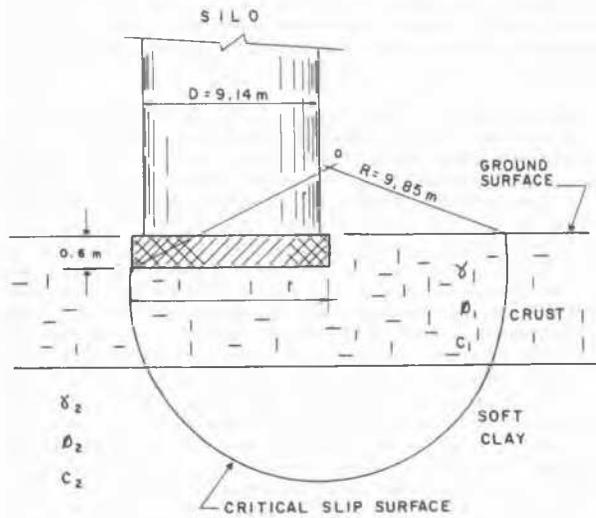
SECTION OF SILO AND SOIL PARAMETERS
